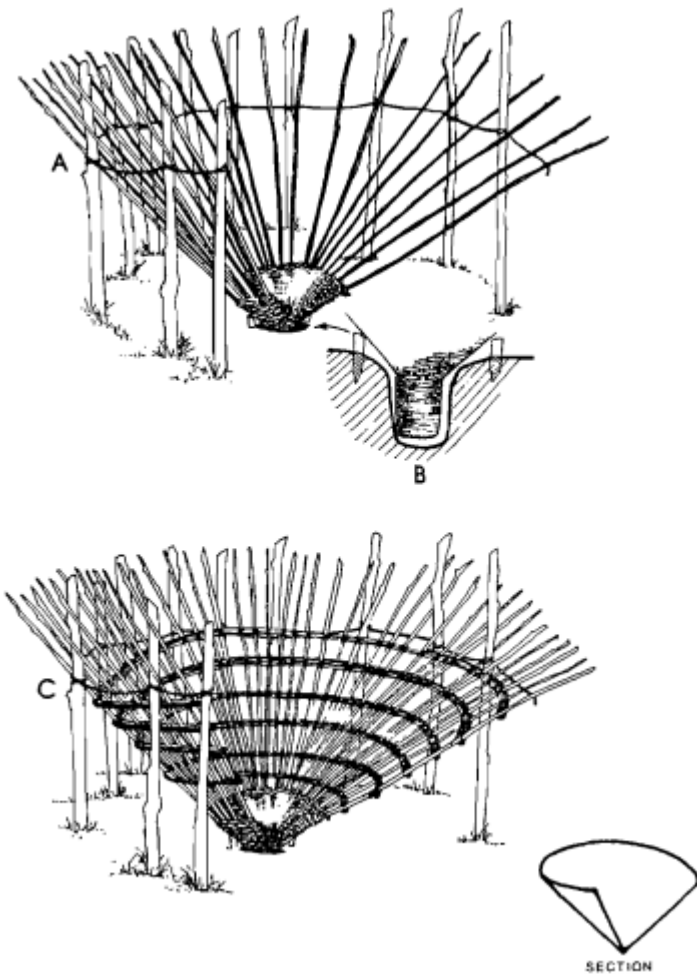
ROOF CONSTRUCTION STAGES (CUNNINGHAM AND GWALA, 1986)
